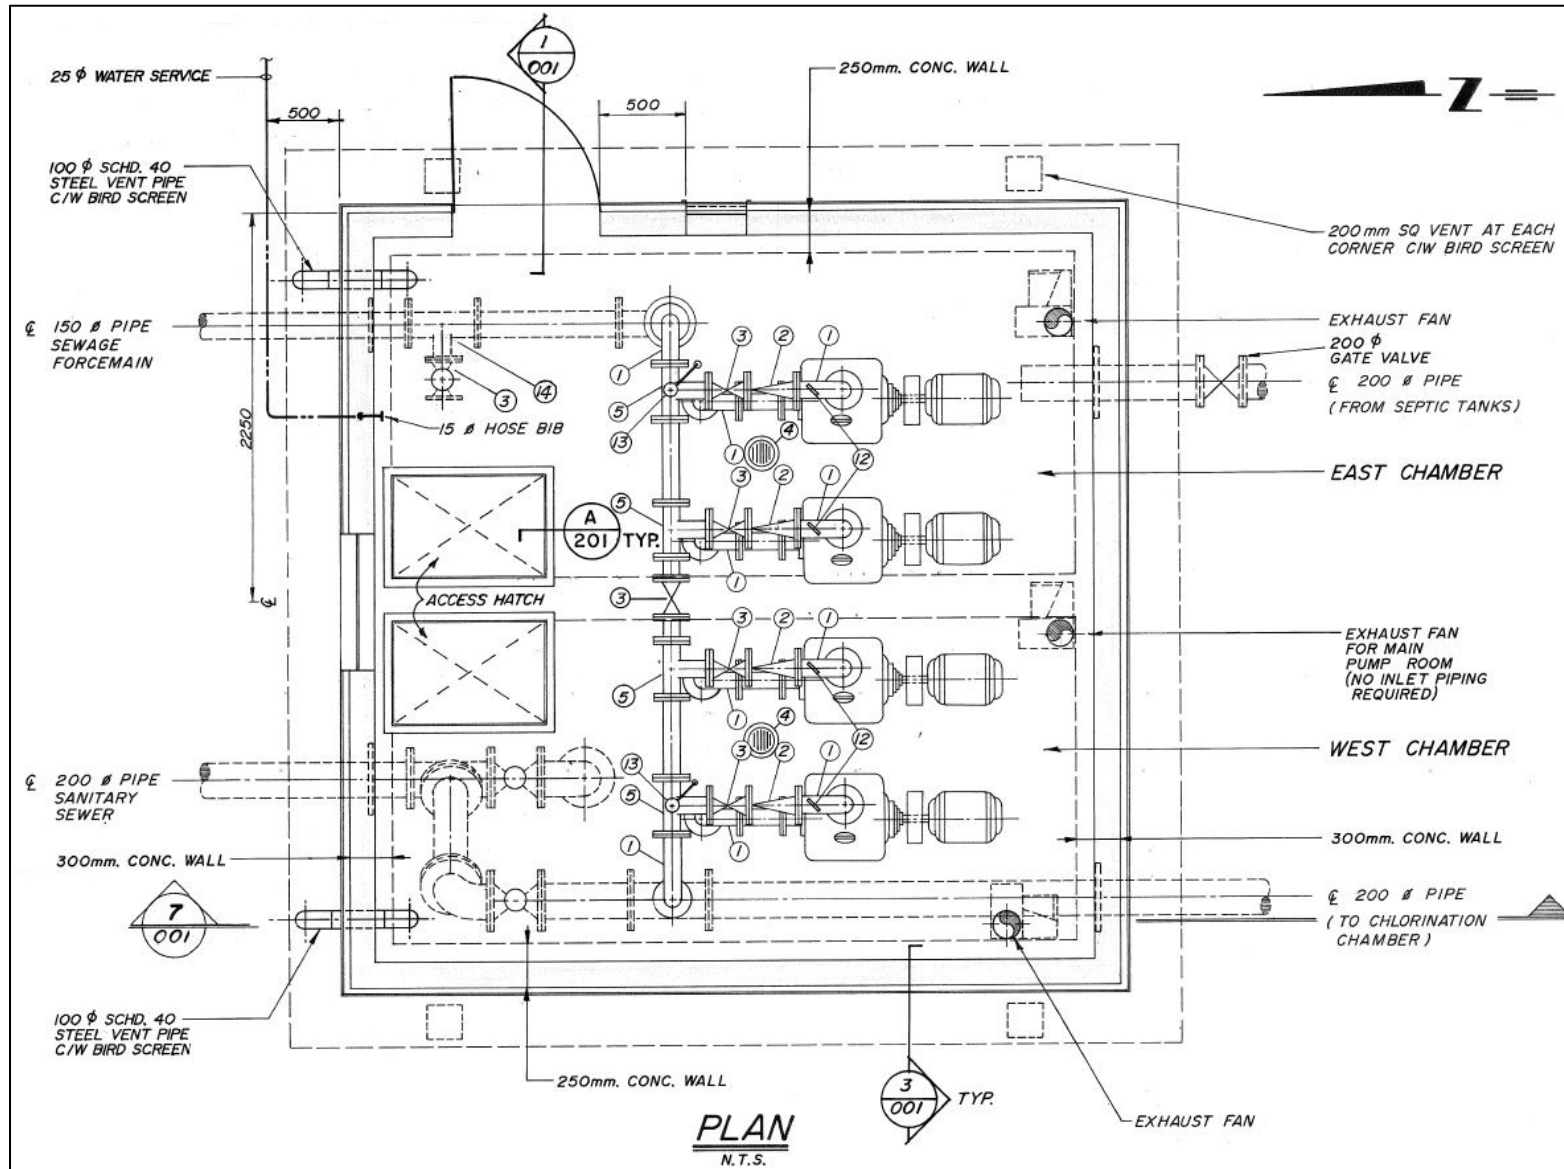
Lift station floor plan (Bullée Consulting Ltd. 1988d)
